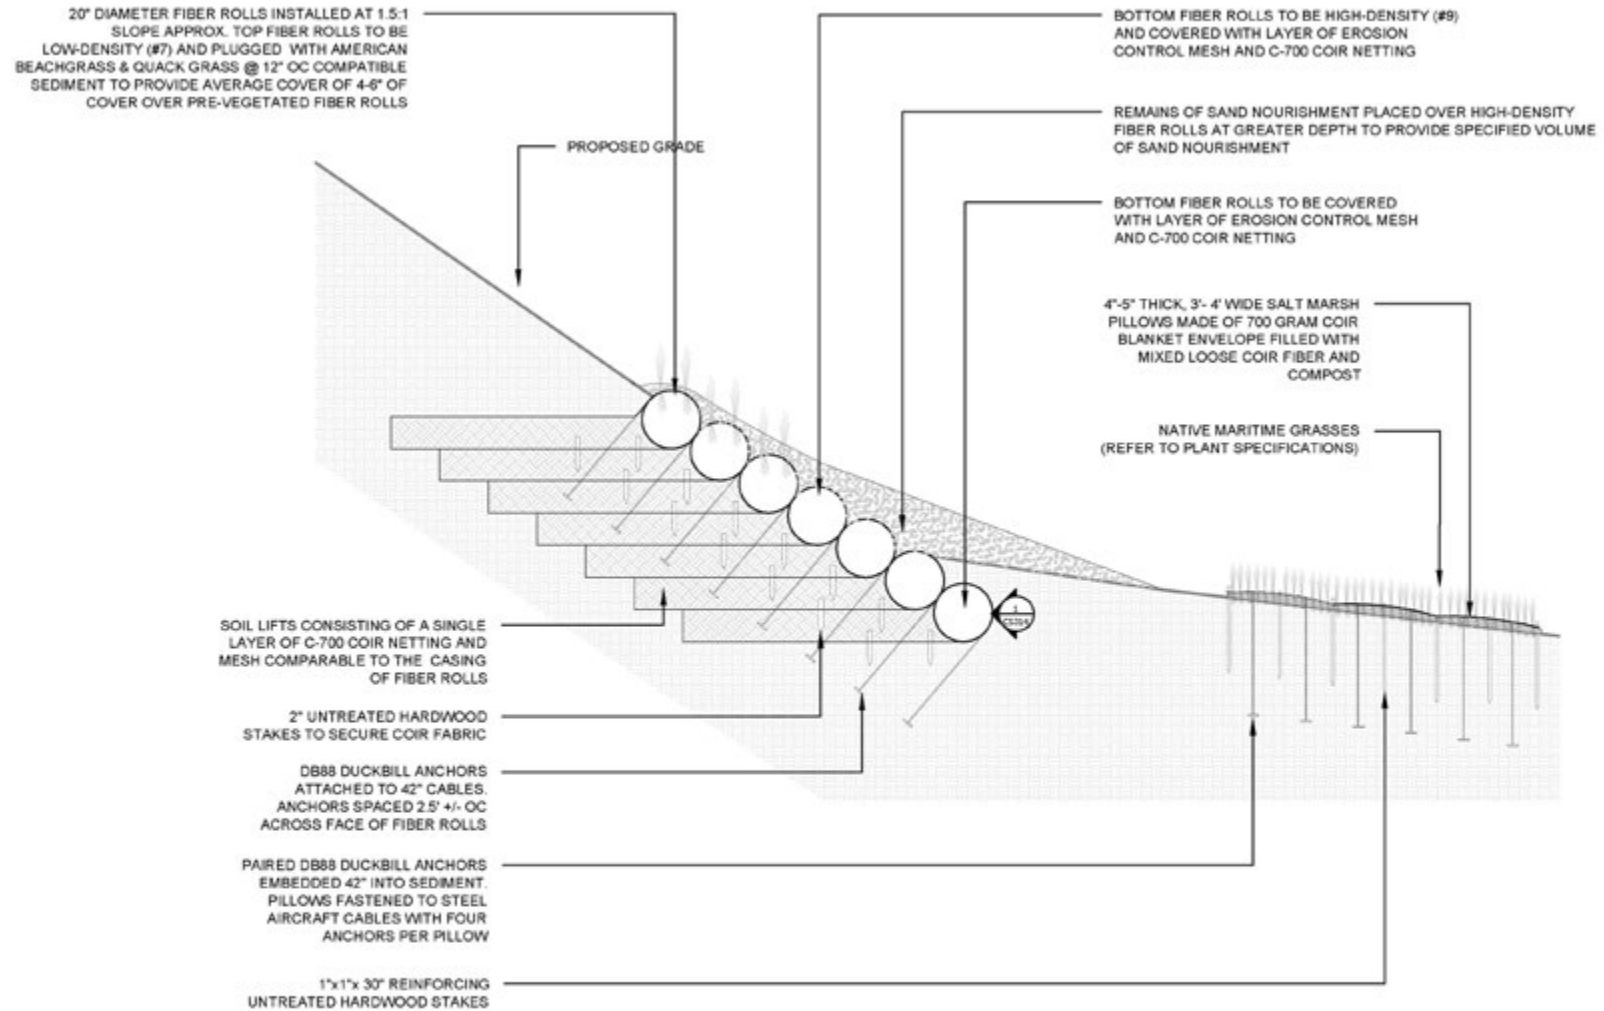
DETAIL PROVIDED BY WILKINSON ECOLOGICAL DESIGN, SPECIALISTS IN COASTAL STABILIZATION CONSTRUCTION
